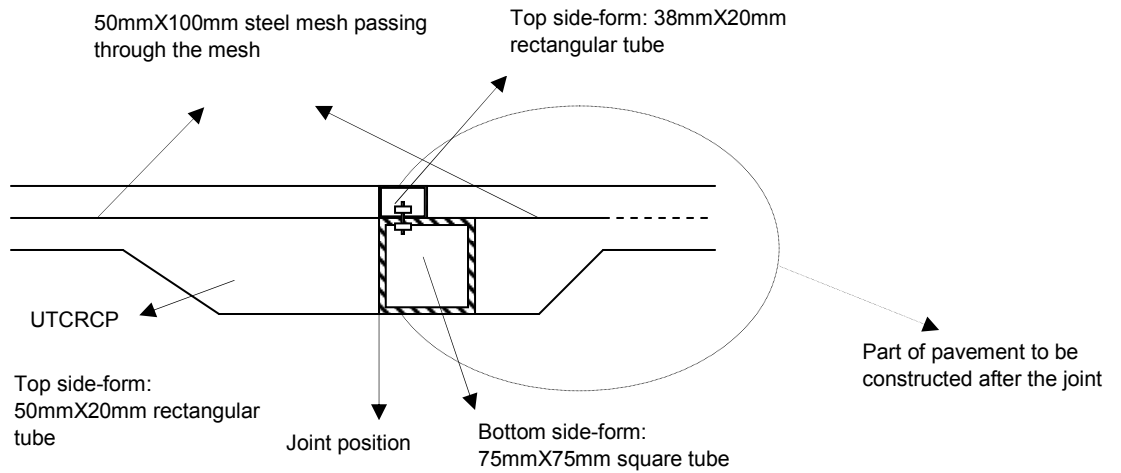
Sketch of form-work of joint with reinforcement mesh trough it (type 2 longitudinal joint)
